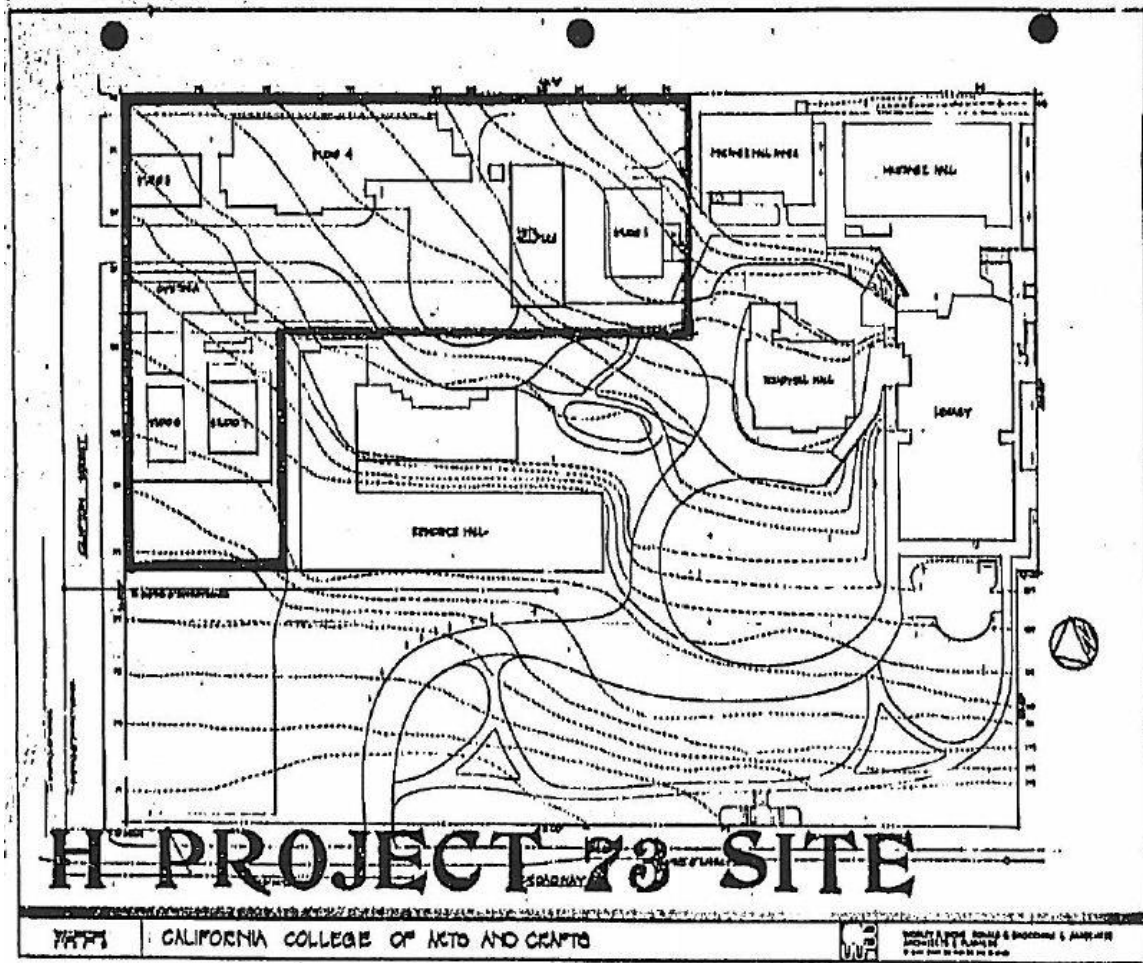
Proposed plan for Project 73 by Wong and Brocchini, prepared for Zoning Submittal, May 15, 1973. The site of proposed new construction is in the upper left. Source: Oakland Building Department Records.
